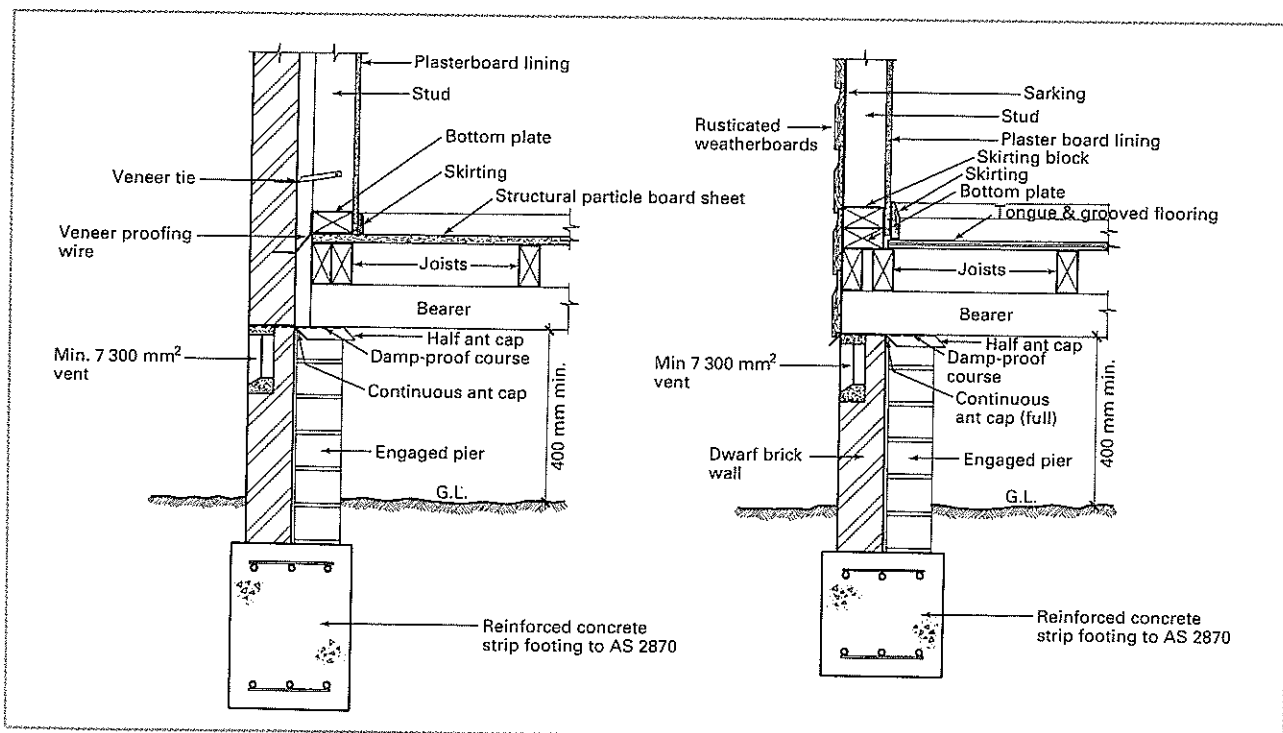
Vertical section through external walls of brick veneer and timber-frame construction
